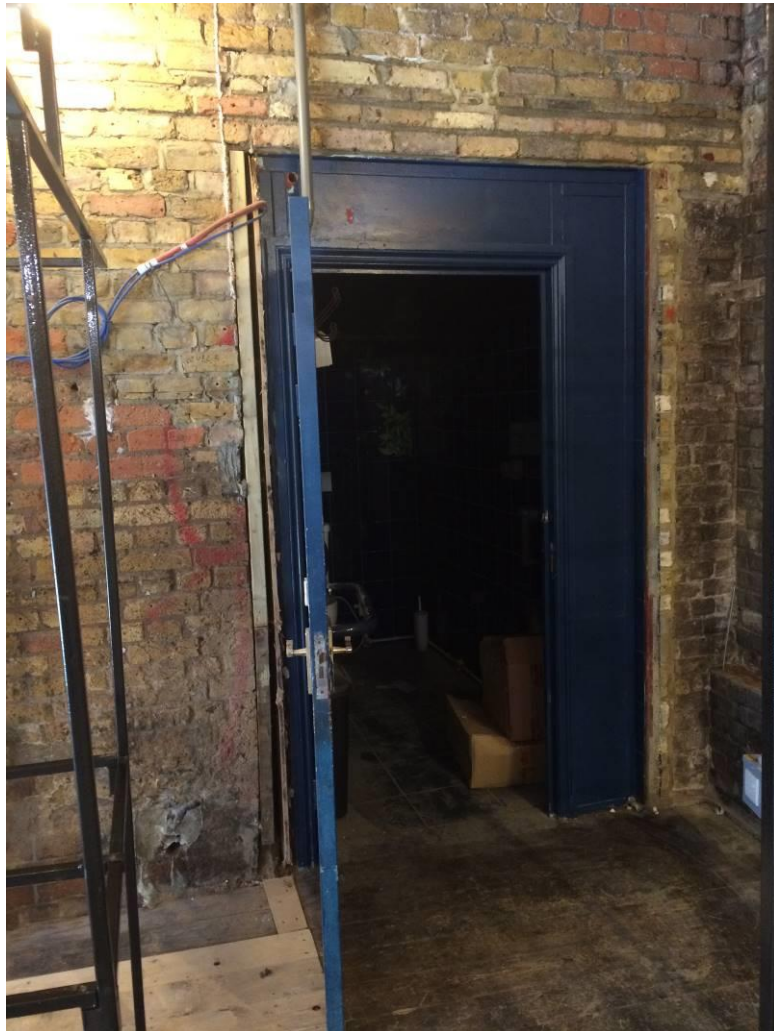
2016 photograph showing interior opening in north west corner. The existing pipe aperture through the wall at low level will be reused in the proposal to take the new sink drain.
